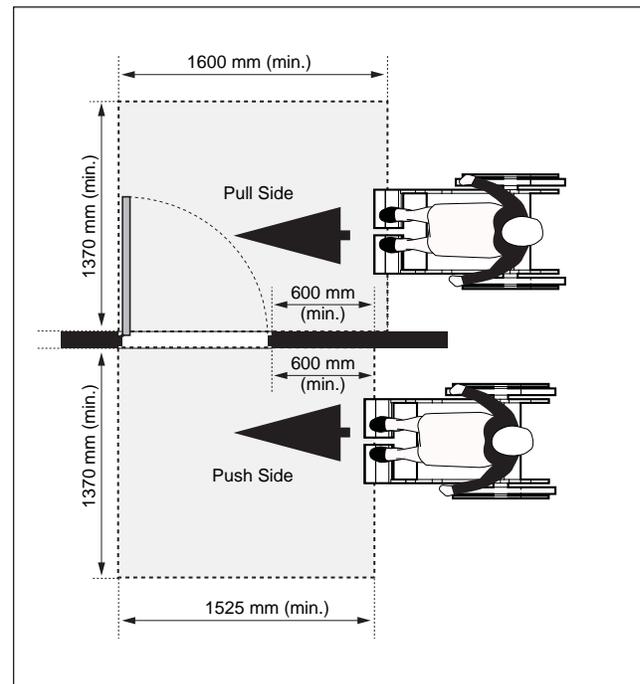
Front and Side Approach at Side-Hinged Door - Plan View
